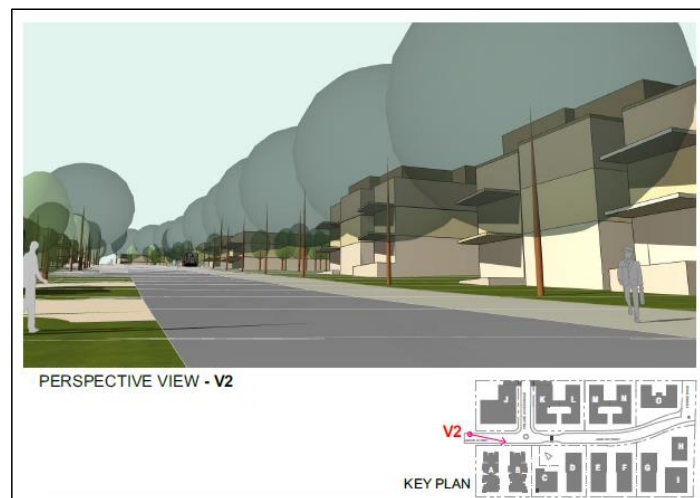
Perspective View plan looking east along Anson Street [M11D]
